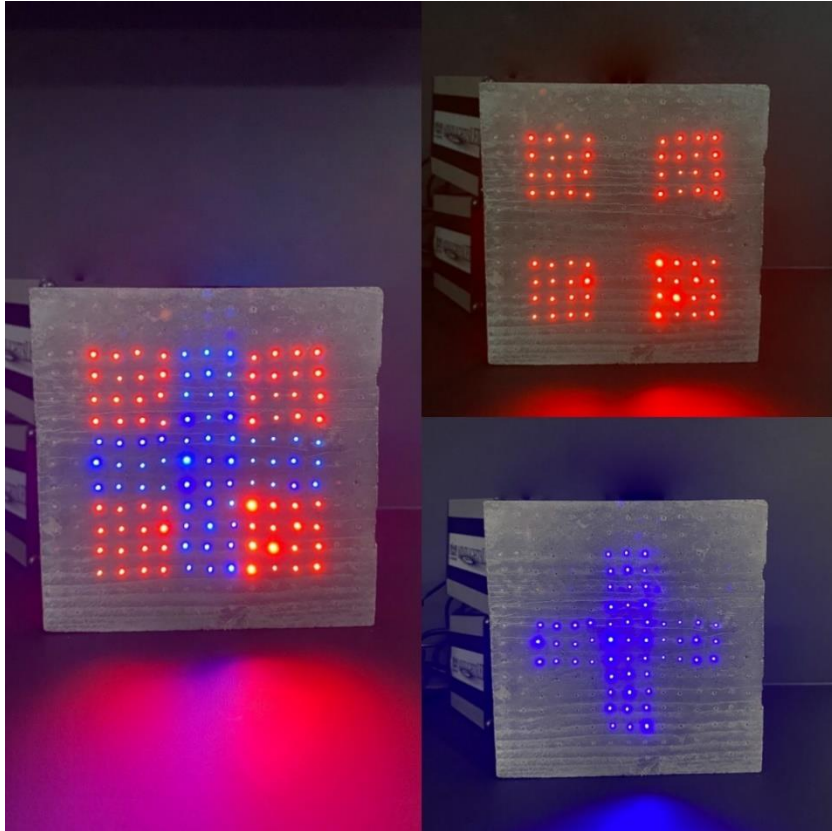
Examples of applications artificial light source to light-permeable concrete slabs
